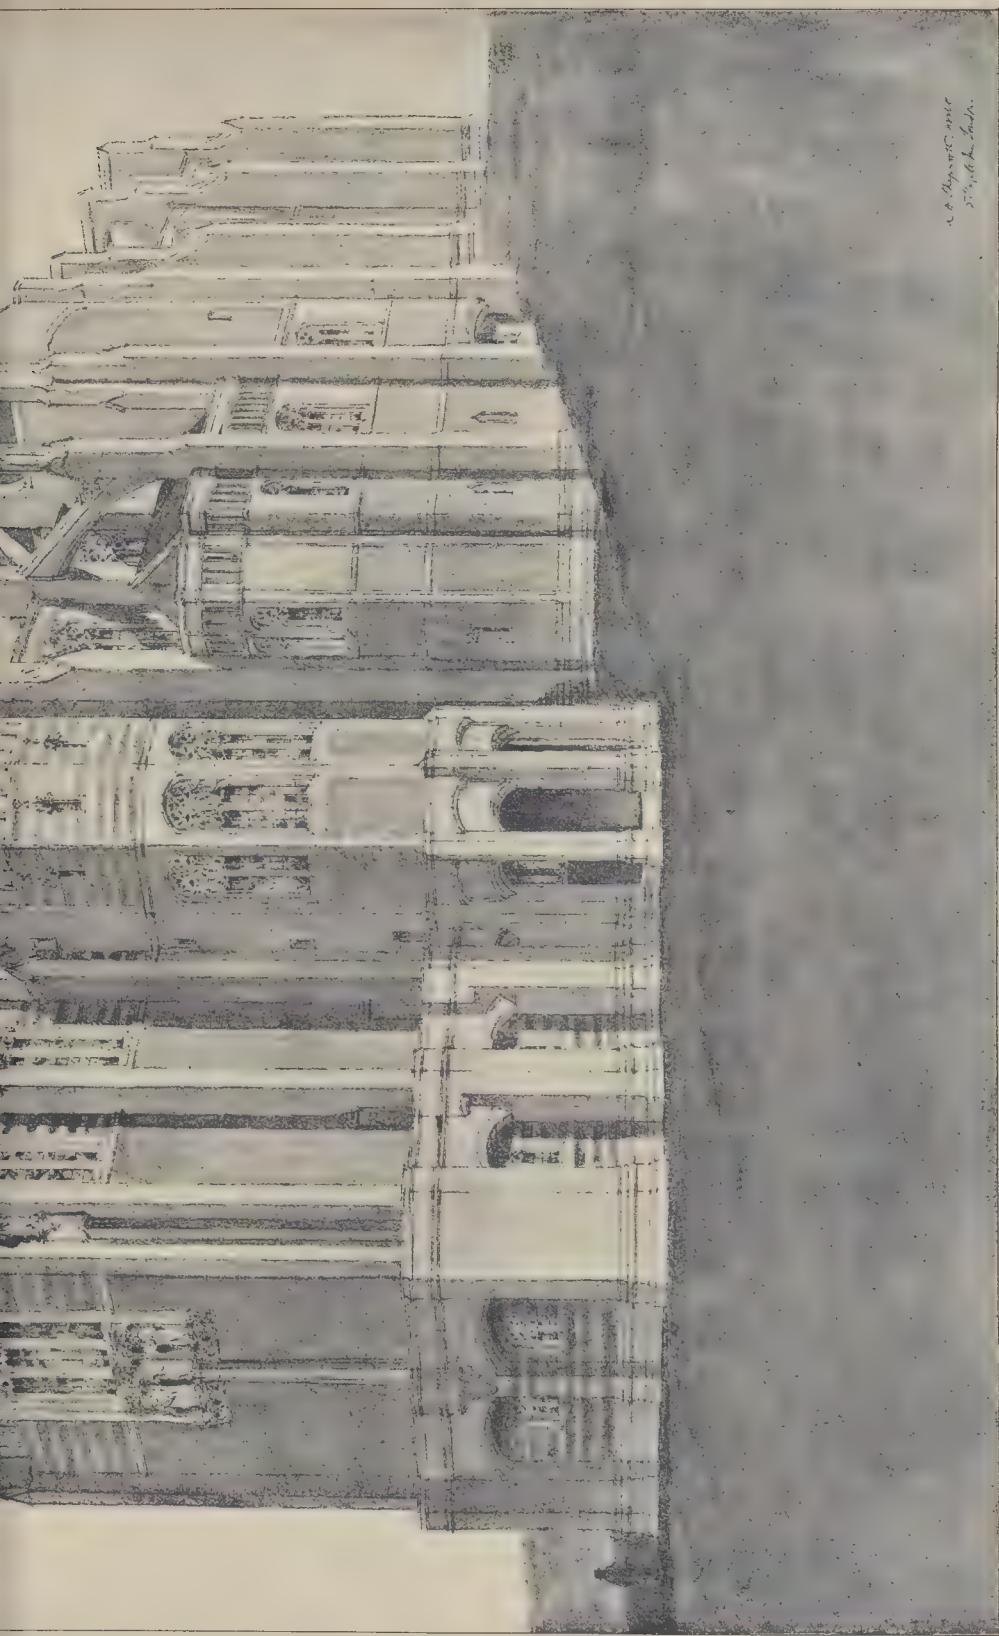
Chapel. The plan is a modification of the original plan of the architect.
